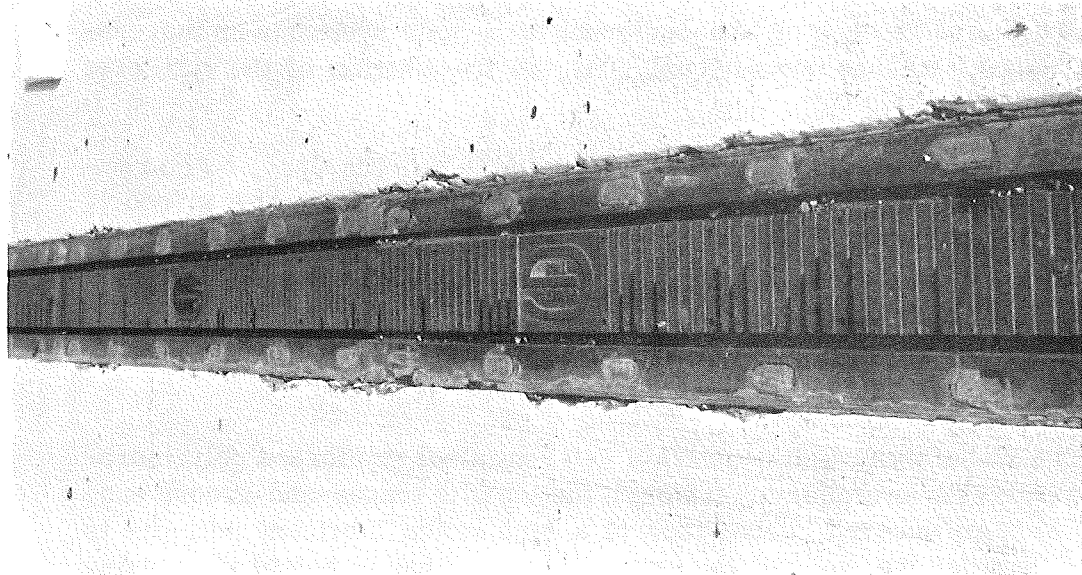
Edge spalling of the bridge deck adjacent to the Transflex pad.
